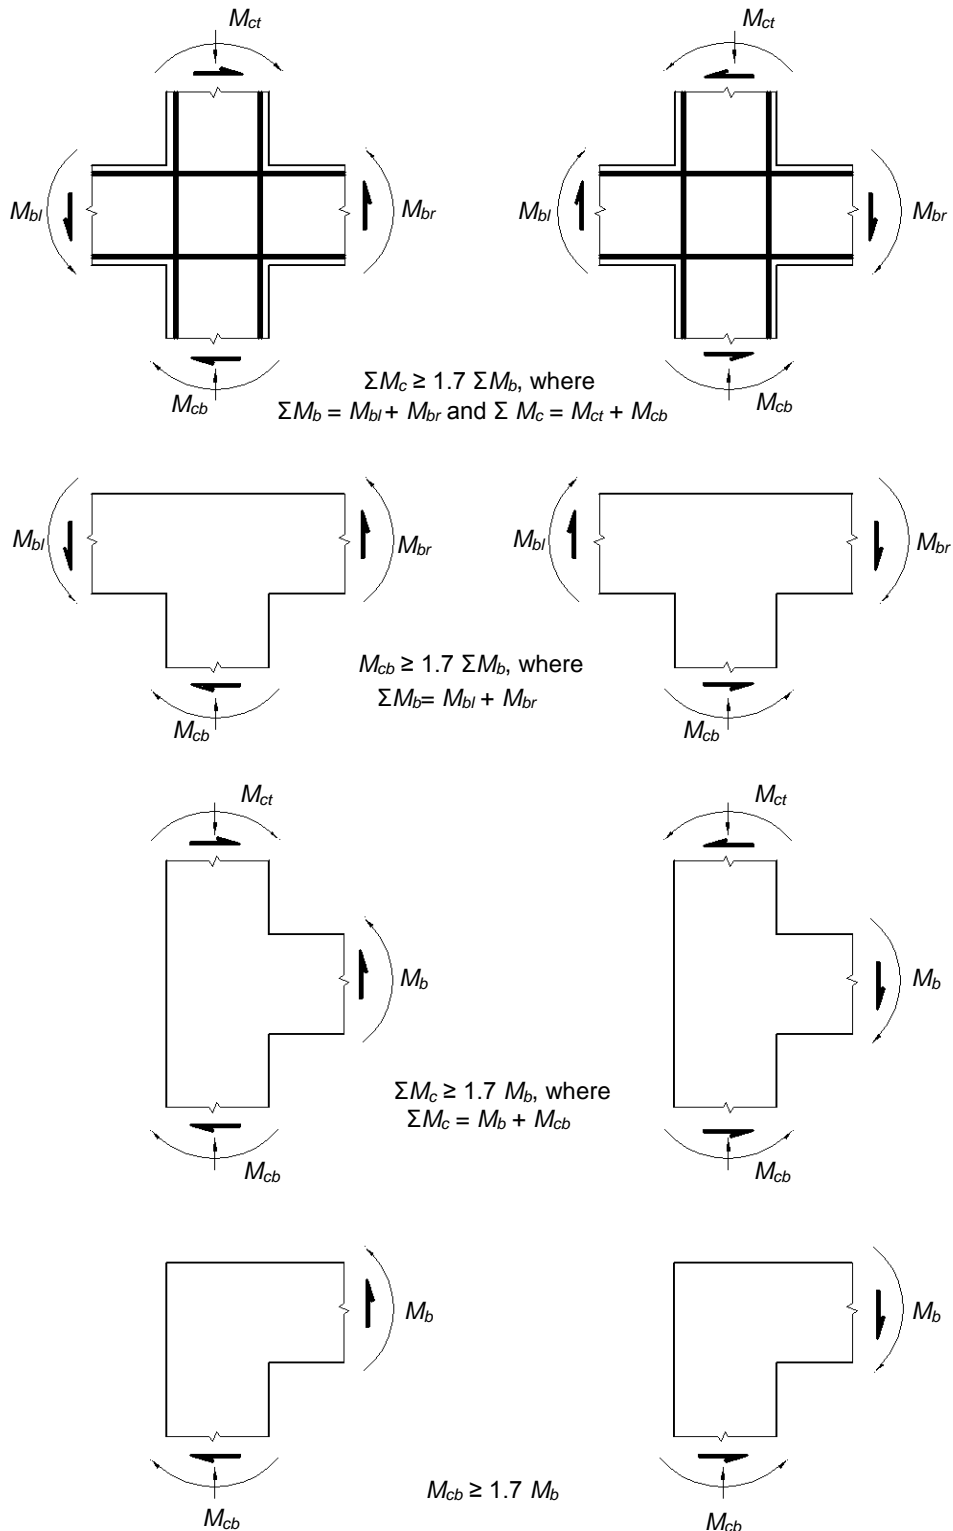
STRONG COLUMN – WEAK BEAM REQUIREMENT
